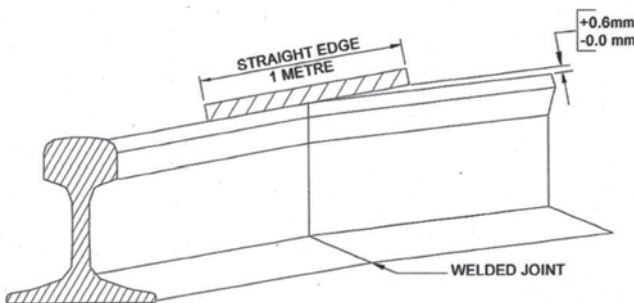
(a) Tolerance for Vertical Misalignment of Welded Joint with New Rails
